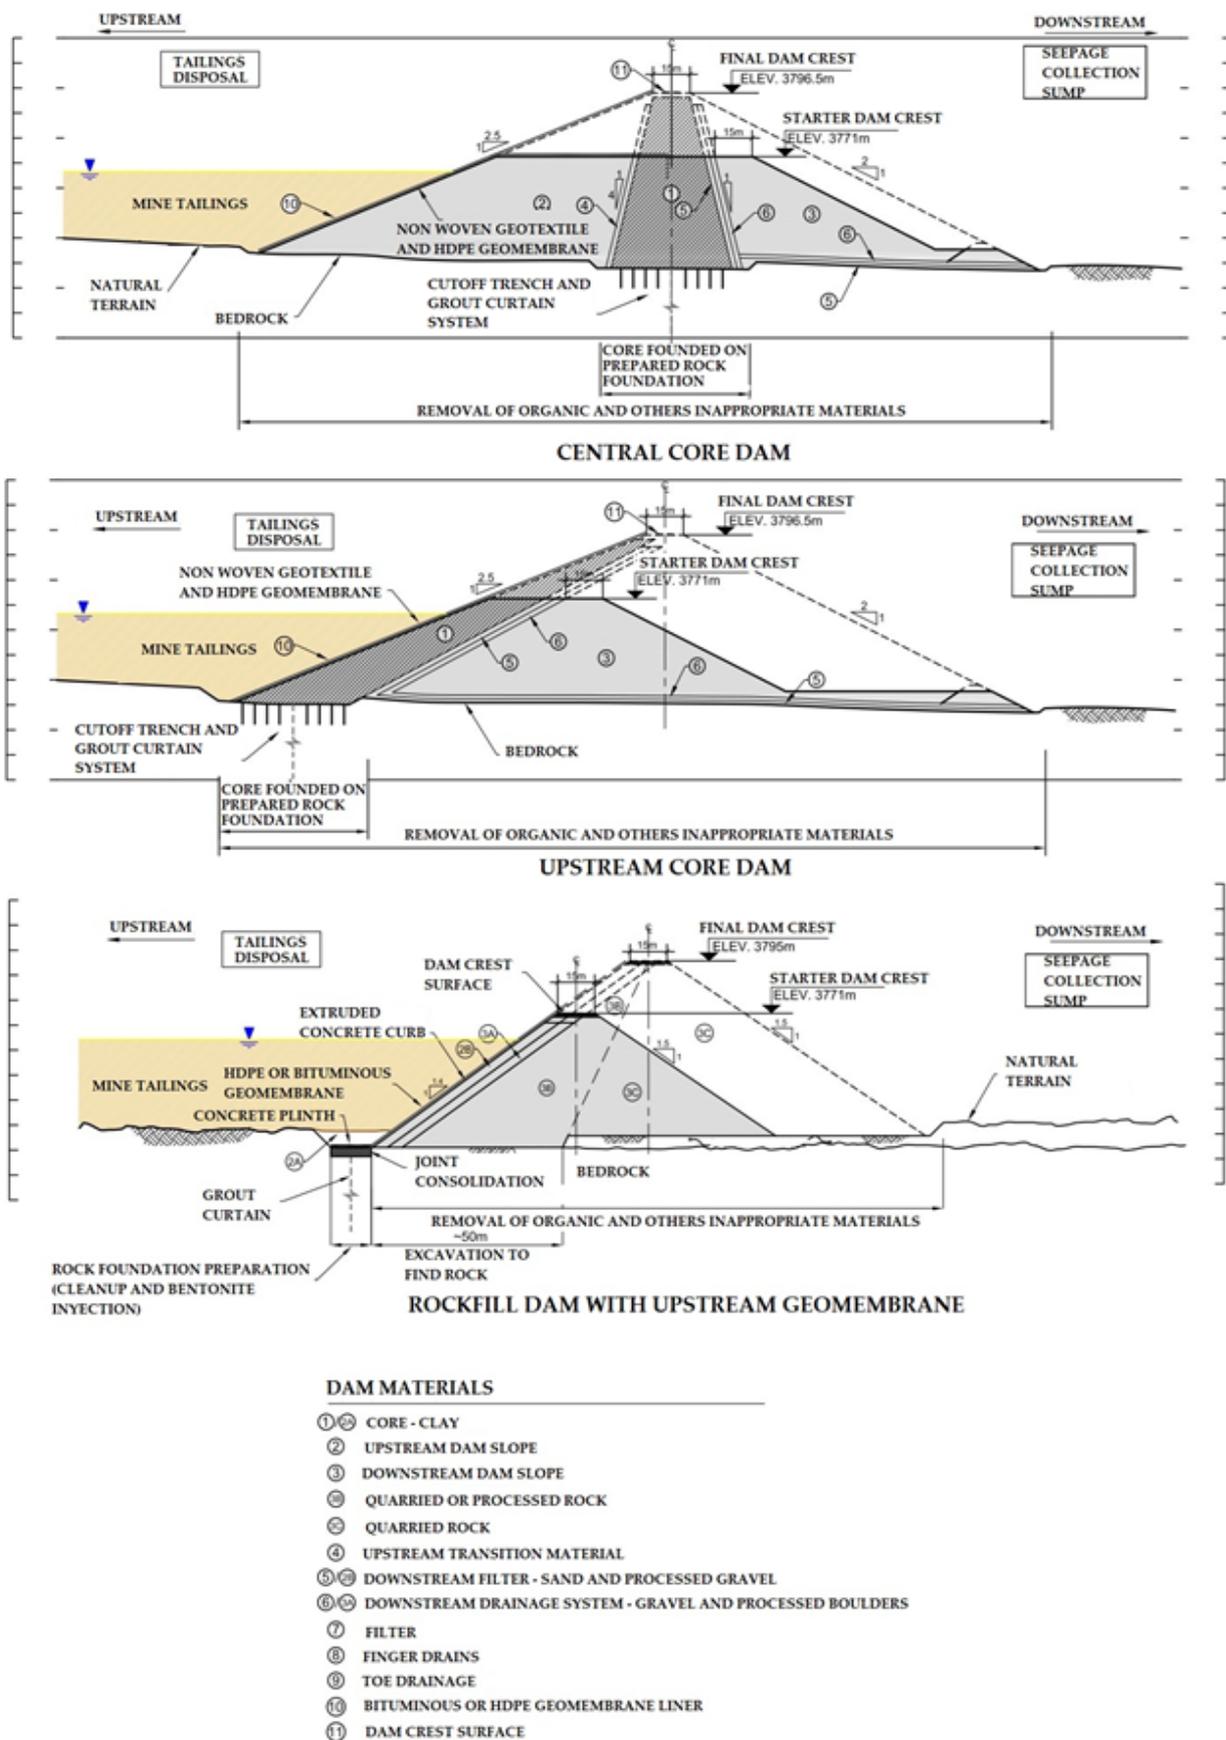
Examples of a geomembrane liner, cutoff trench, and grout curtain system in a TSF.
